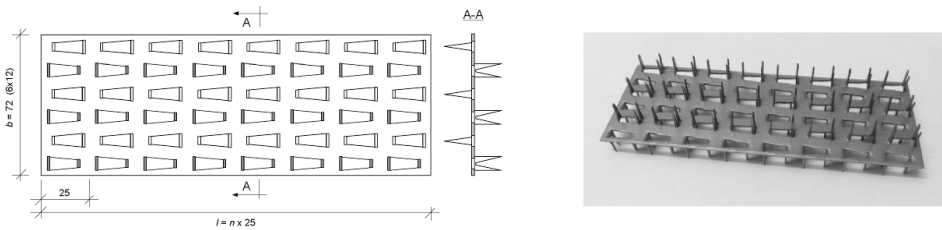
Double-sided punched metal plate Sepa-SE2P, 72×200 mm², (dimensions in mm).
